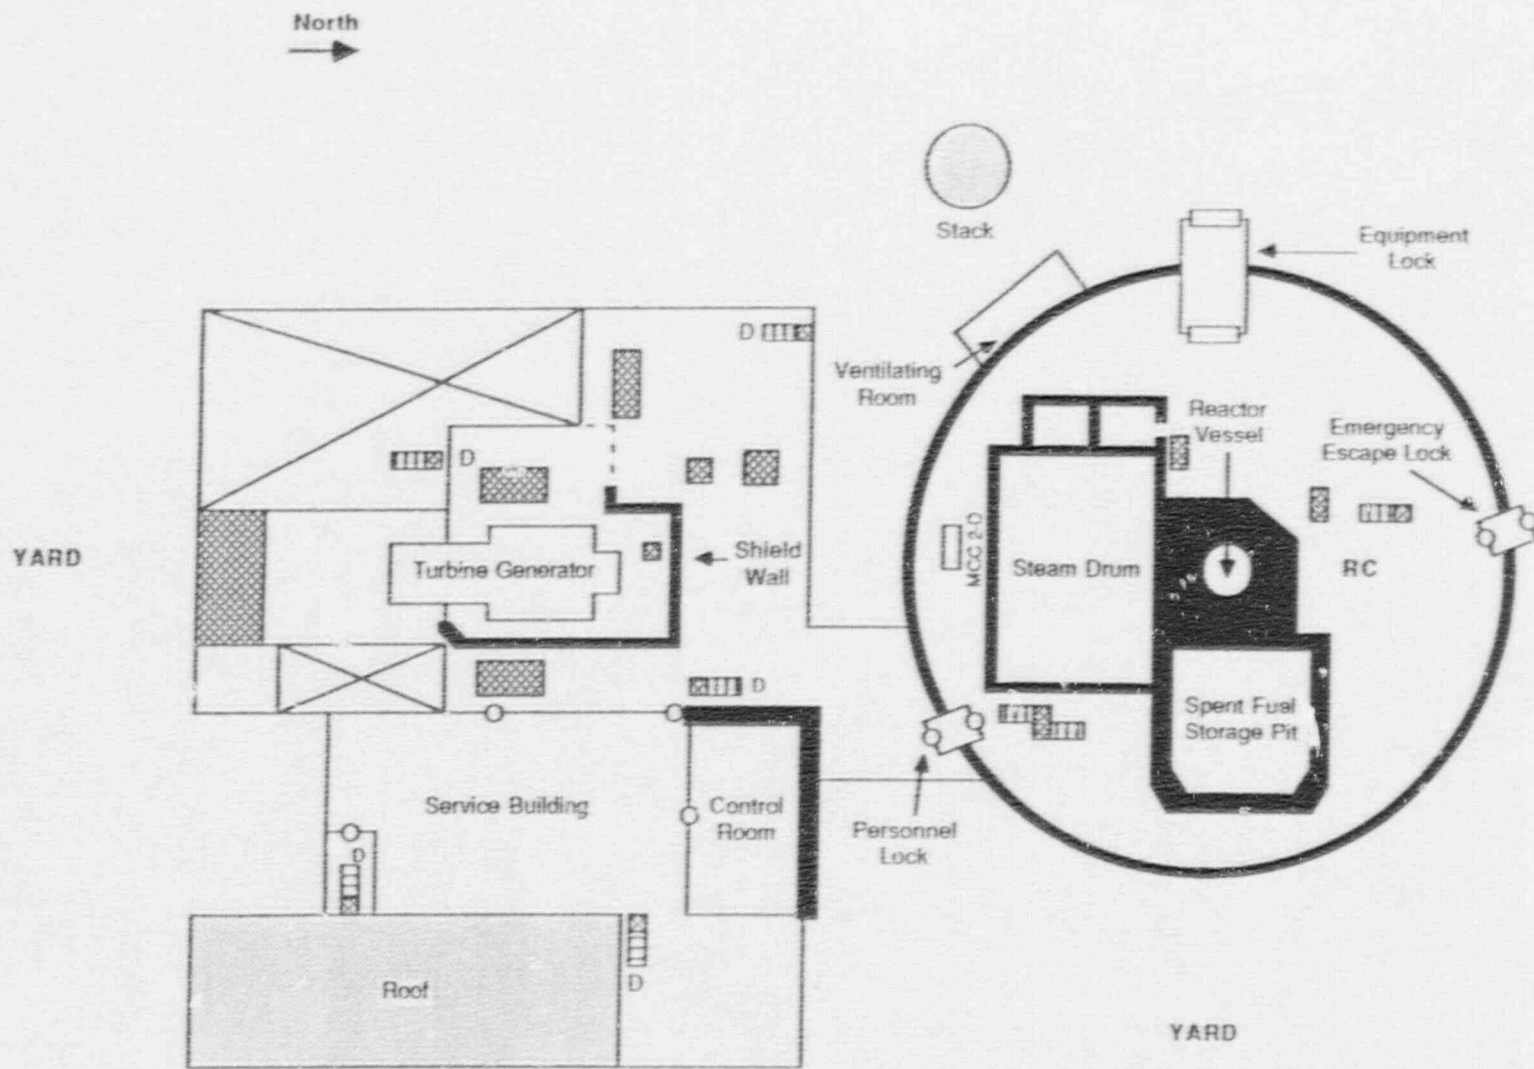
Big Rock Point Station Arrangement, Plan Above Grade (Below Elevation 598')
